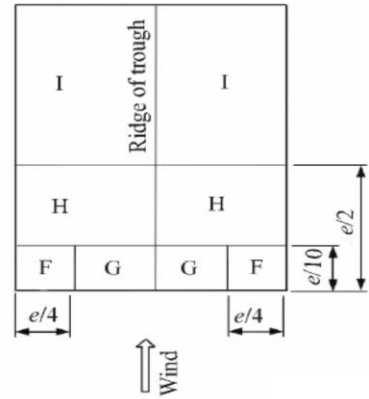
Loading zones of the walls and roof of the building when the wind acts normal to the gable wall
